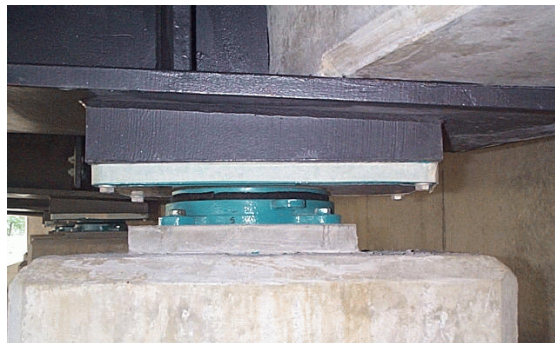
Attachment by bolts in tapped holes (bearing plate is welded to flange)
